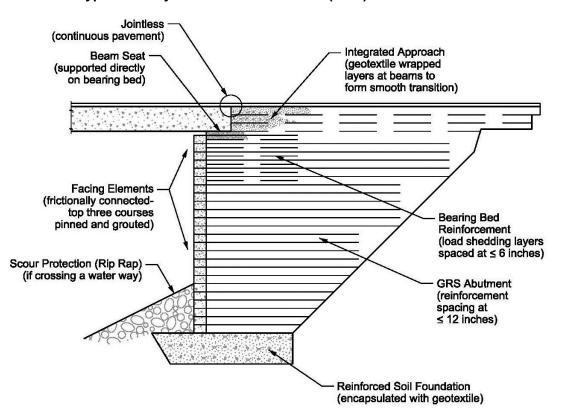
Typical Geosynthetic Reinforced Soil (GRS) Abutment Detail
